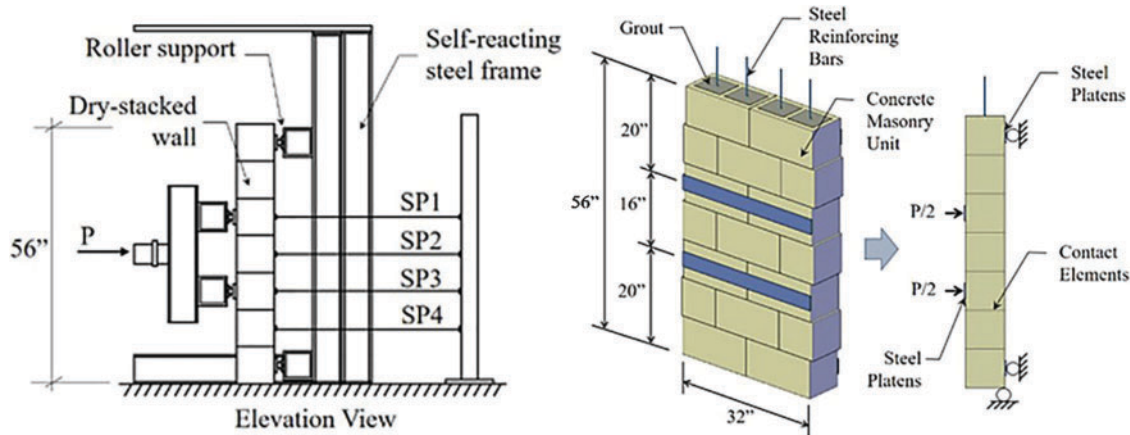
Dry-stacked wall test setup under OOP loading [146]. Adapted with permission from Ref. [146]. Copyright ©2019, Elsevier B.V.
